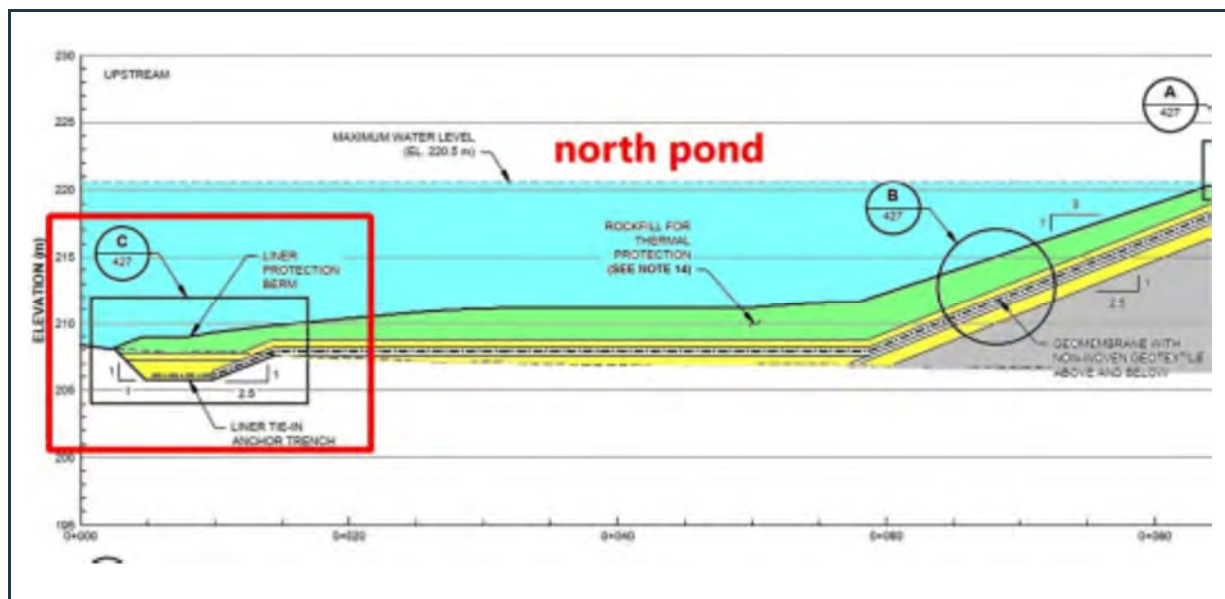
Section at the upstream side of the main dam (note the detail within the red rectangle at the left, showing an anchor trench into the permafrost). – Source: KM105 Sedimentation Pond Design Brief and Issued for Construction Drawings – Knight Piésold Ltd. 2021
